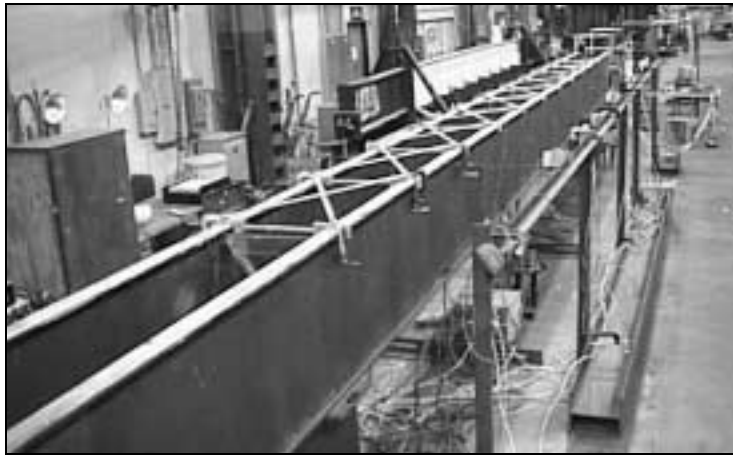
Overall Test Setup for Rectangular Girder Tests
